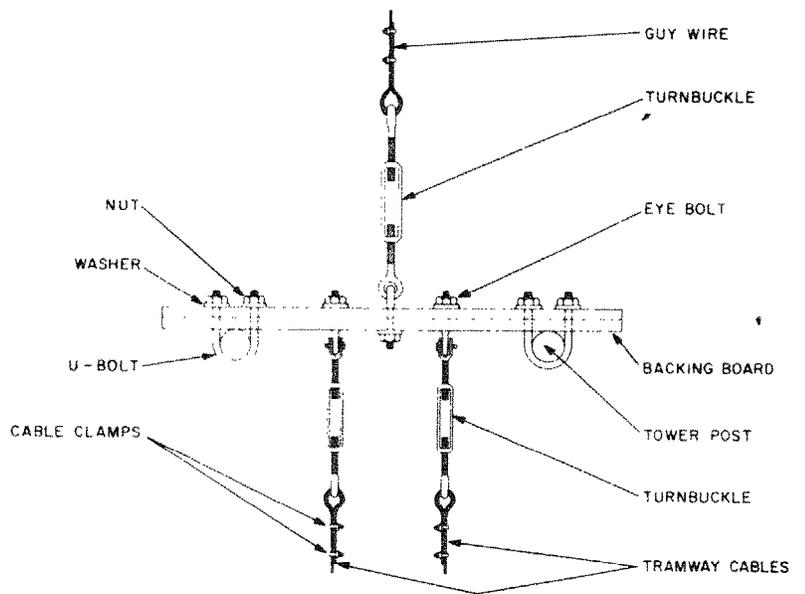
Tramway cables were attached to the tower at a special backing board as shown in this construction drawing.
